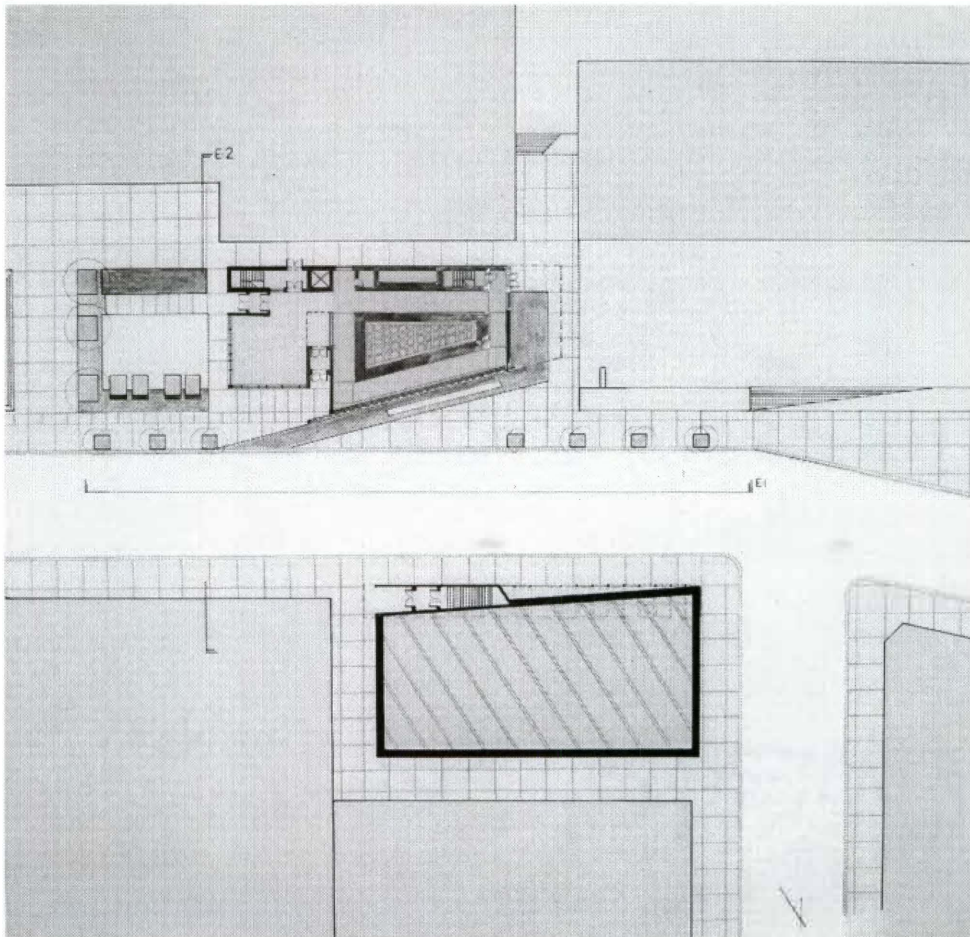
FLOOR PLAN - URBAN PLAZA GROUND FLOOR
